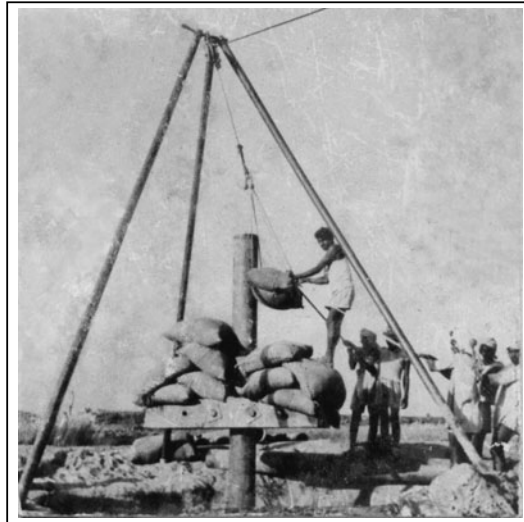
Loading of sand bags on wooden clamps to lower casing pipes in a manually drilled tube well
